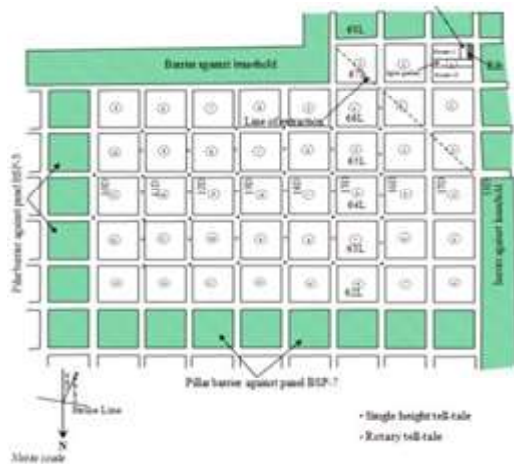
Plan showing the locations of proposed geo-technical instruments for strata movement study in panel BSP-4.
